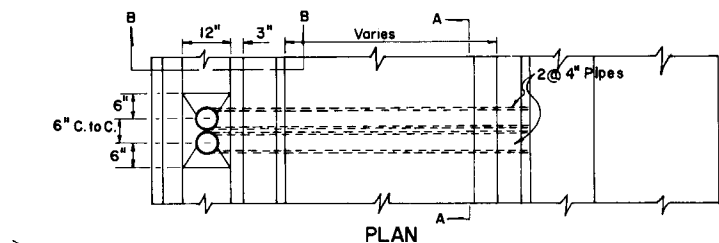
### DETAIL OF CONCRETE COLLAR FOR EXTENSION OF EXISTING PIPE CULVERTS
